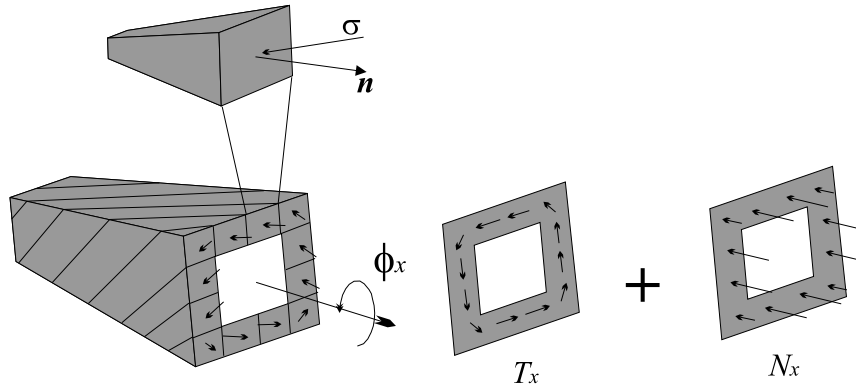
Generalized stresses coupling in a cracked RC beam.
